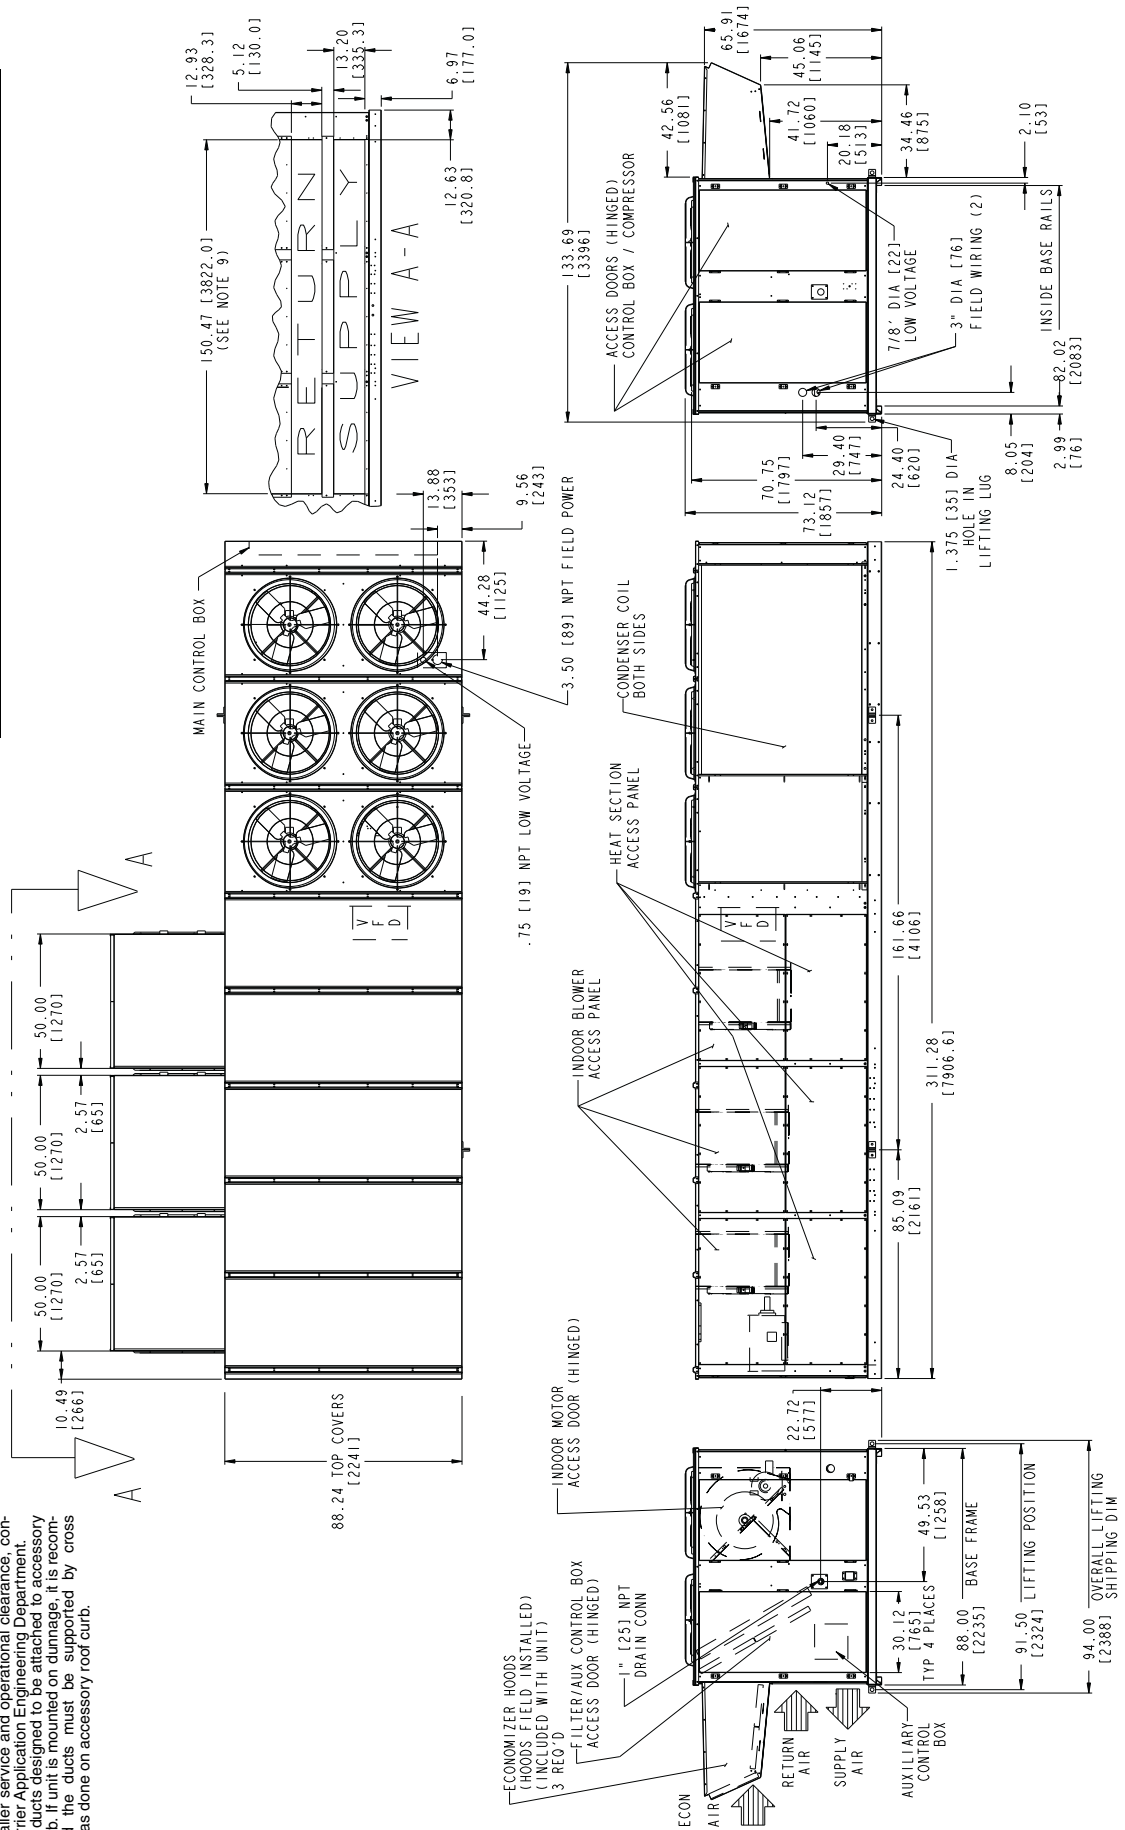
Base Unit Dimensions — 50AW,AY060
